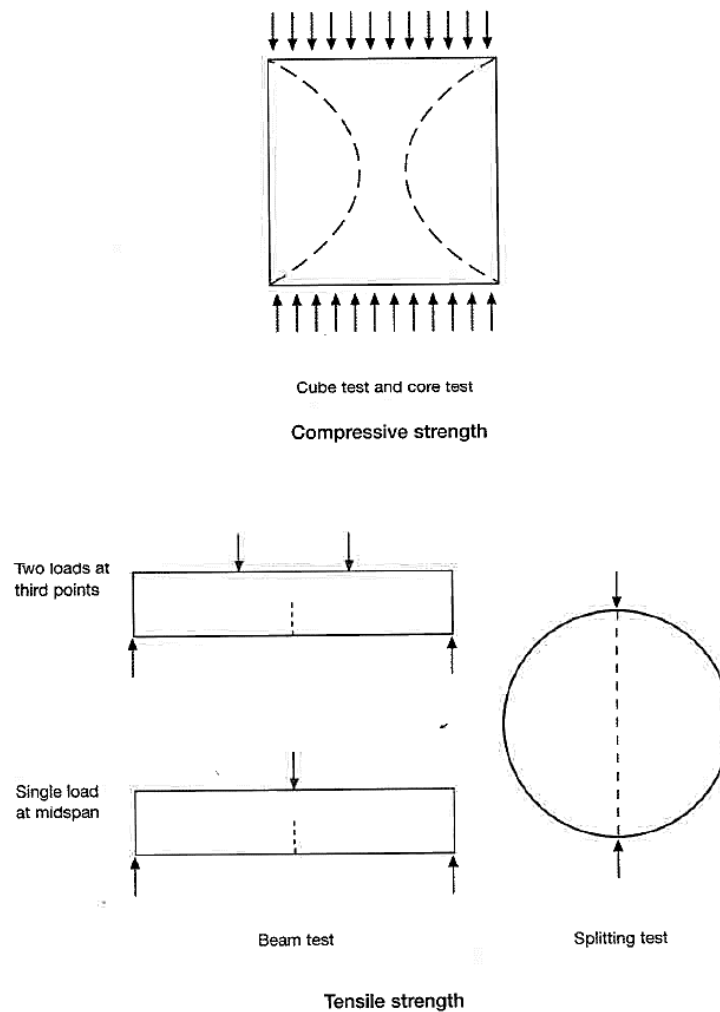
Laboratory tests used to determine the compressive and tensile strength of concrete (Source: Owens, 2013)
